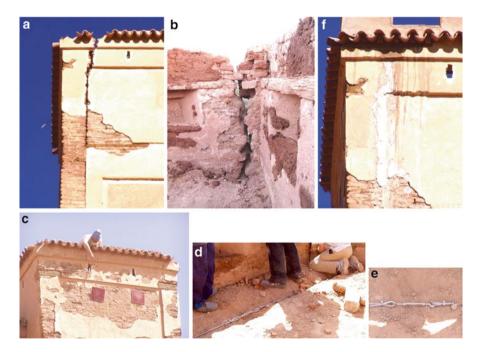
Repair of earth block walls, crack repair: anchoring [76]. (a) Before repair, view of crack from exterior; (b) before repair, view of crack from interior; (c) guiding the cables through the eyes of the anchor plates; (d) running of cables through ceiling; (e) turnbuckle; and (f) after repair, view of crack closed with a cement slurry
